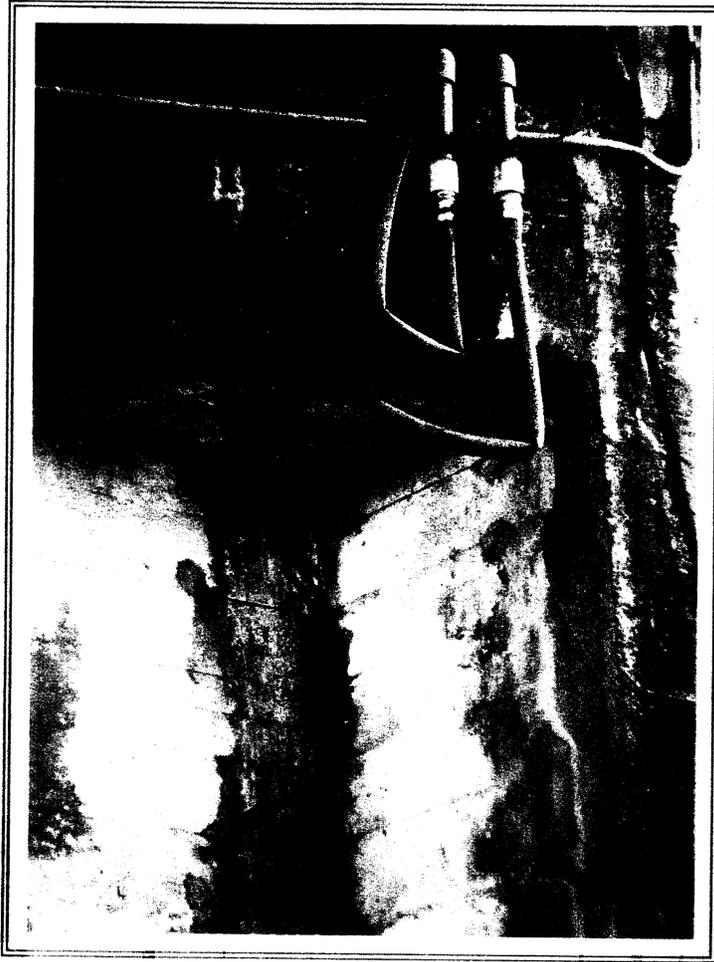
South Bascule, North Face - Severe vertical cracking at STA 0+45.8. This crack extends for 24' down the wall with a width of up to 3/4" and a depth in excess of 3 inches.
